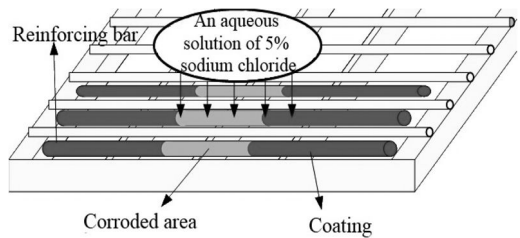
Outline of the corrosion accelerating test by the salt spray testing.
